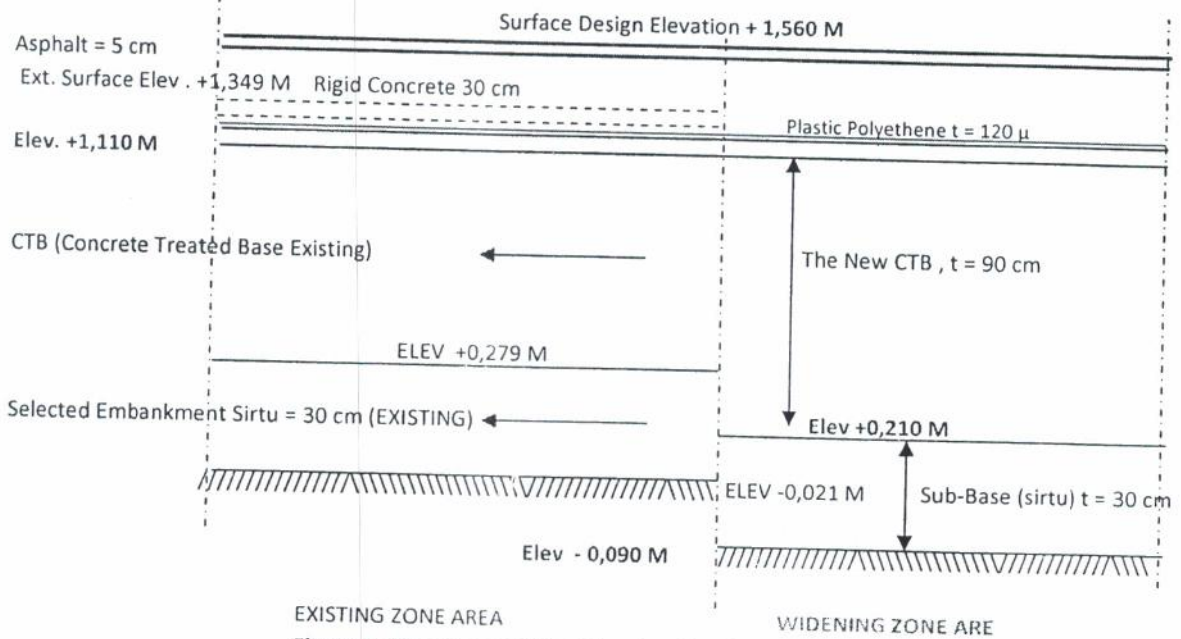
The Proposed Road Construction in STA 8+000 JICT
